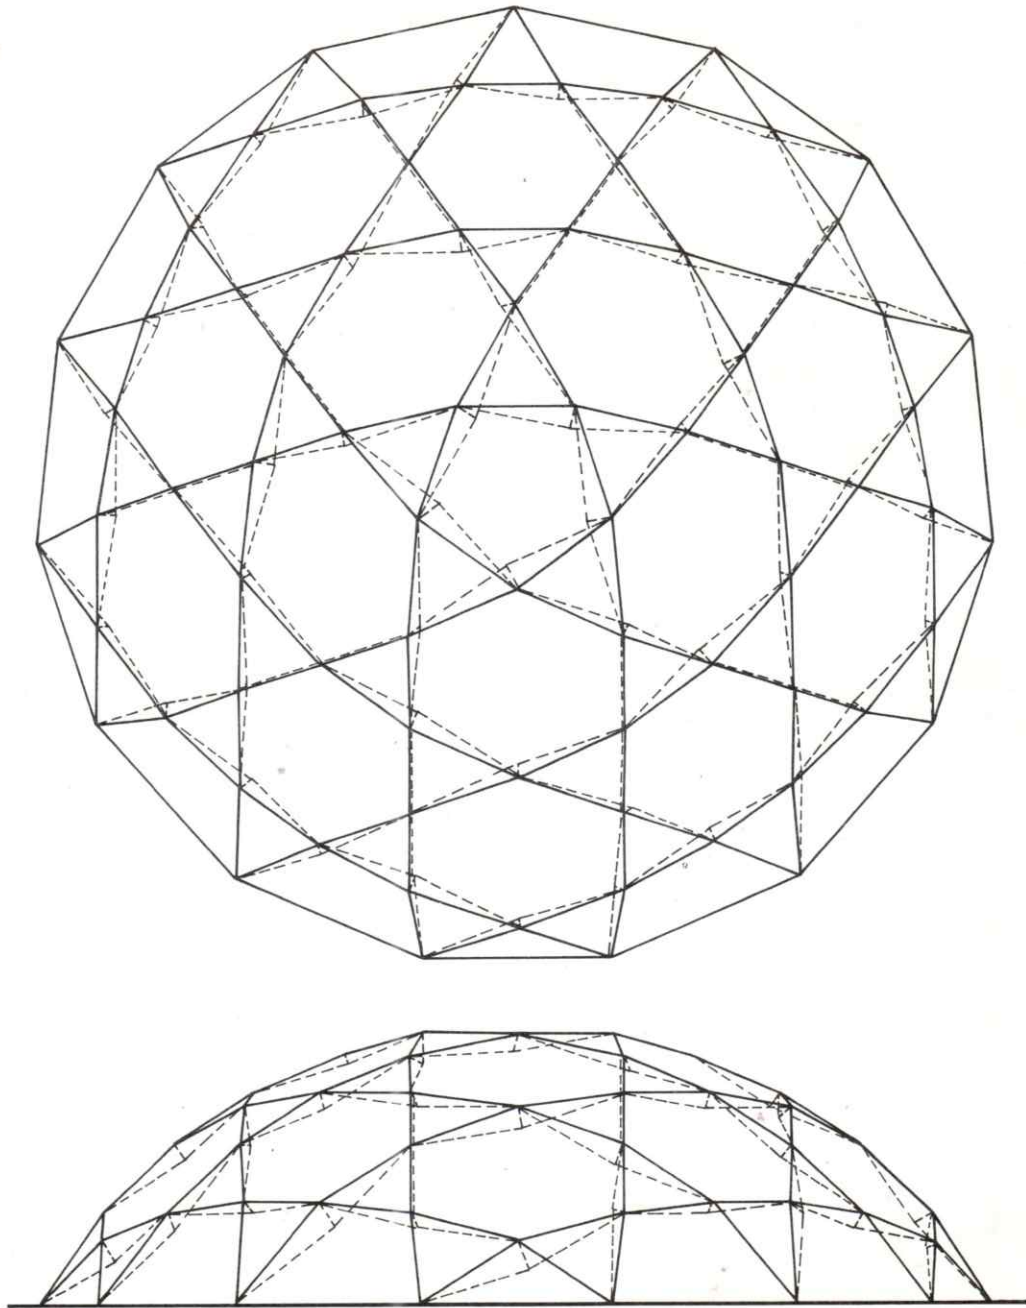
Plan and elevation of 6^V Alternate dome similar to Fig. 63 and 64. Dotted members compression solid are tensile.
